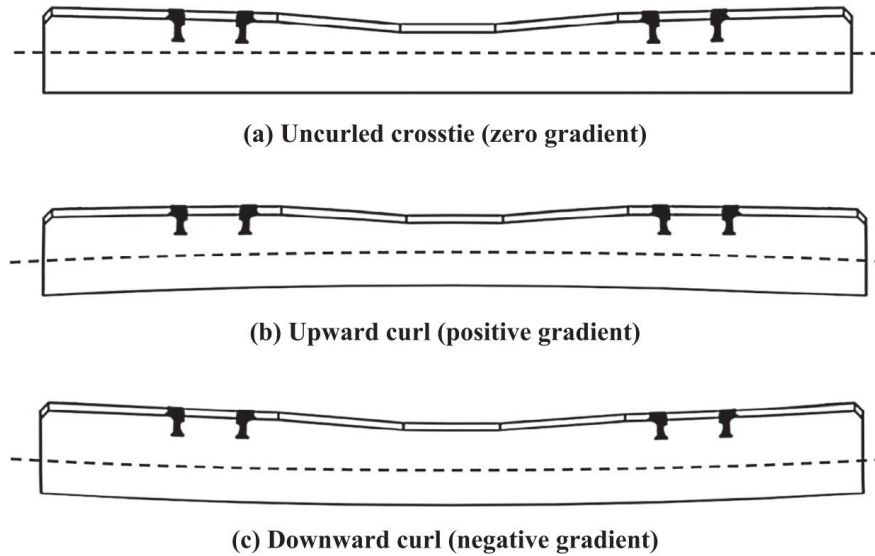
Schematic drawings of concrete crosstie curling geometry (Wolf et al., 2016)
